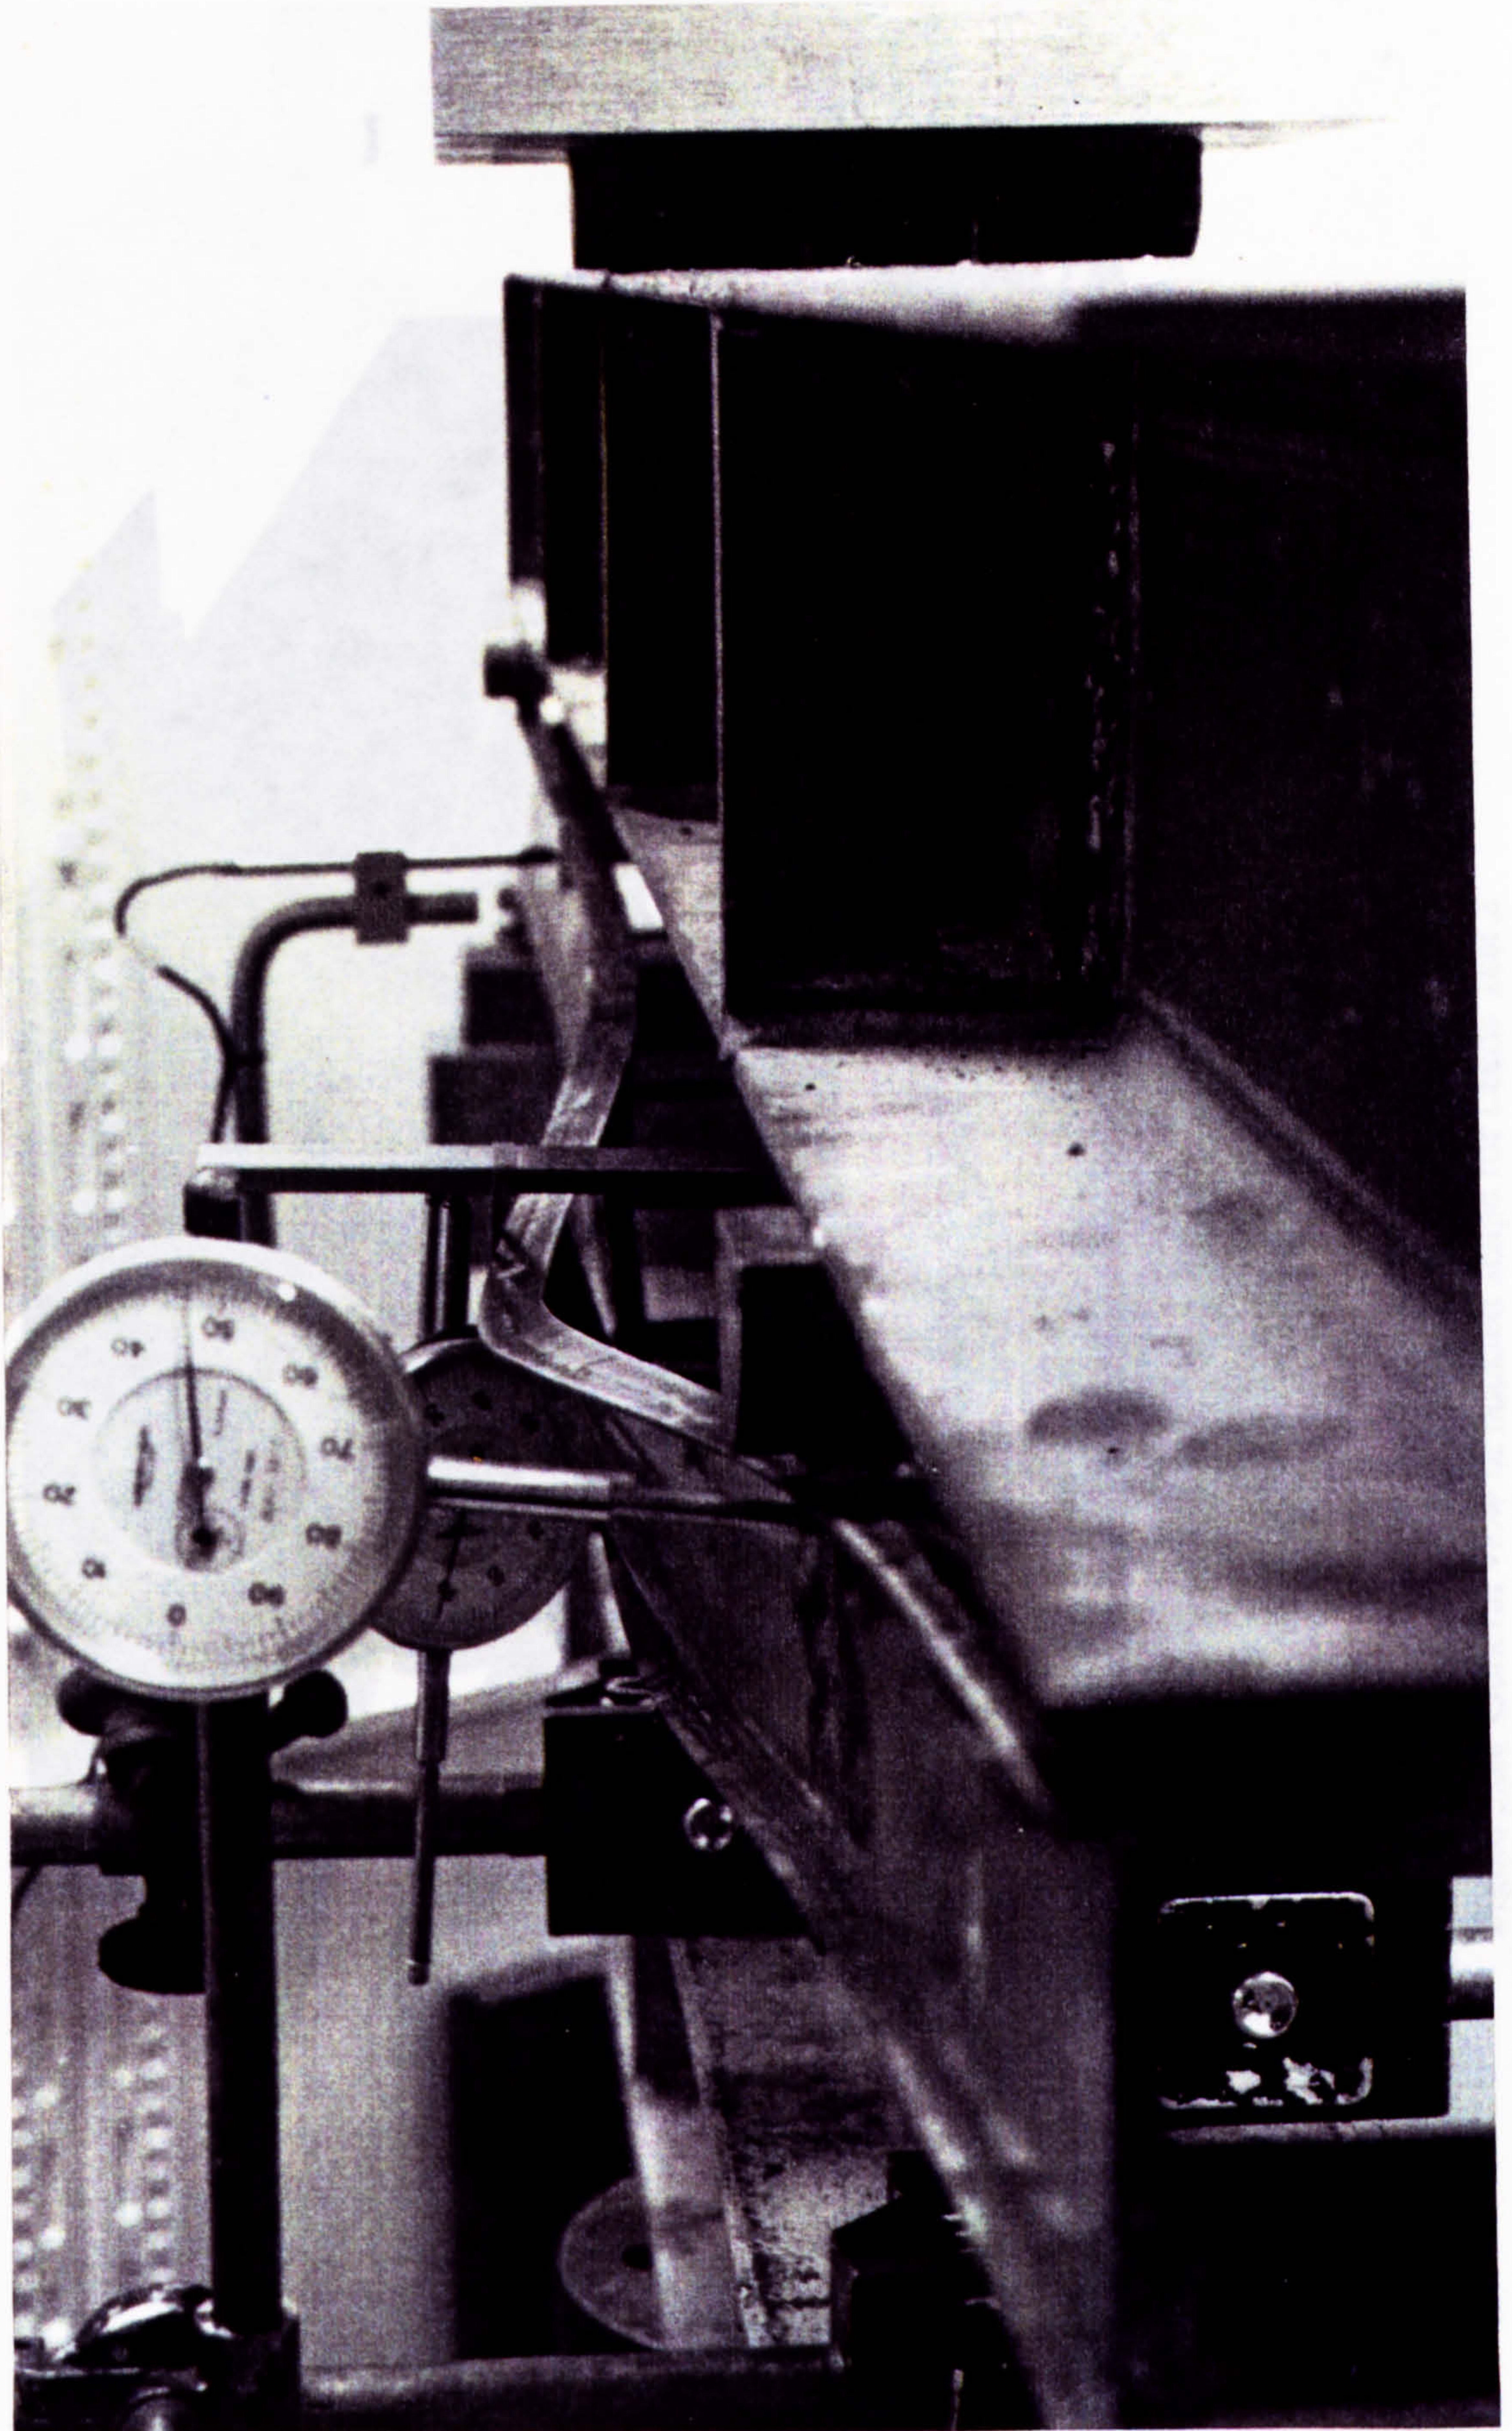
Final buckled shape of compression flange for Leeds Test 2
